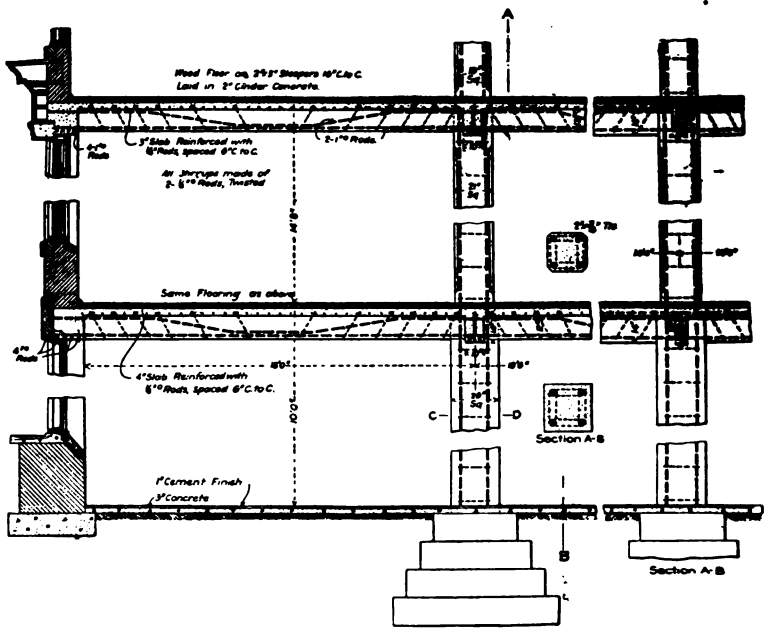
Part Section of Hugh Bilgram Machine Shop, Reinforced Cement Construction Co.'s System.
